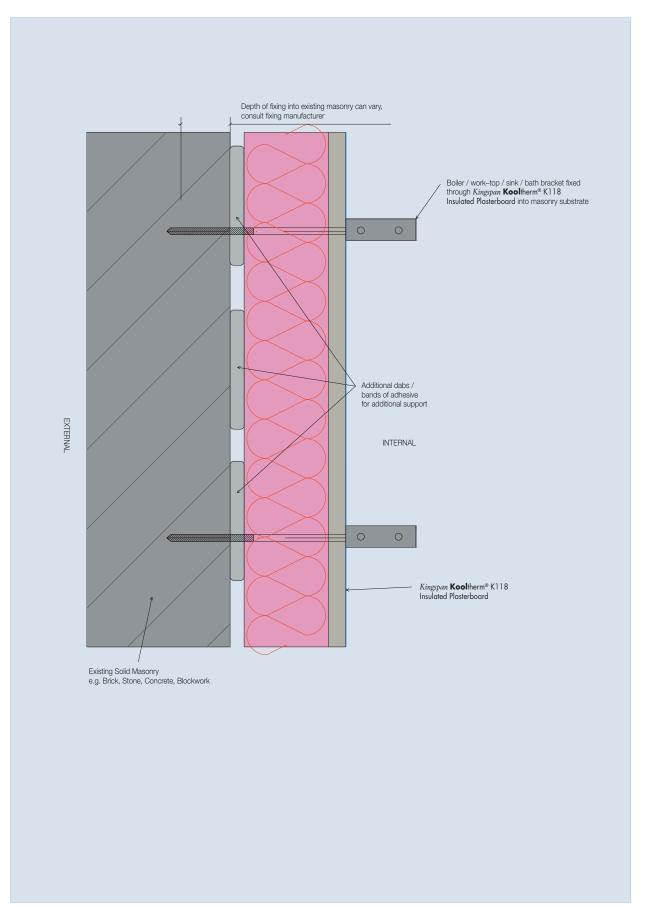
Heavy Surface Mounted Fittings Detail (Adhered)
